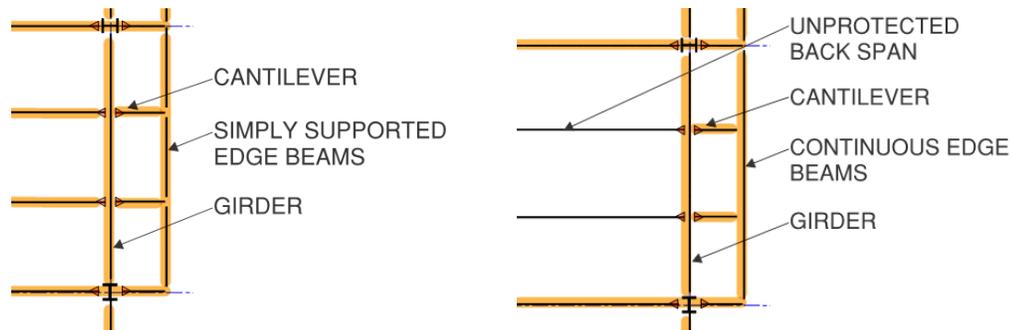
Cantilever framing revision between prescriptive (left) and alternative (right)
